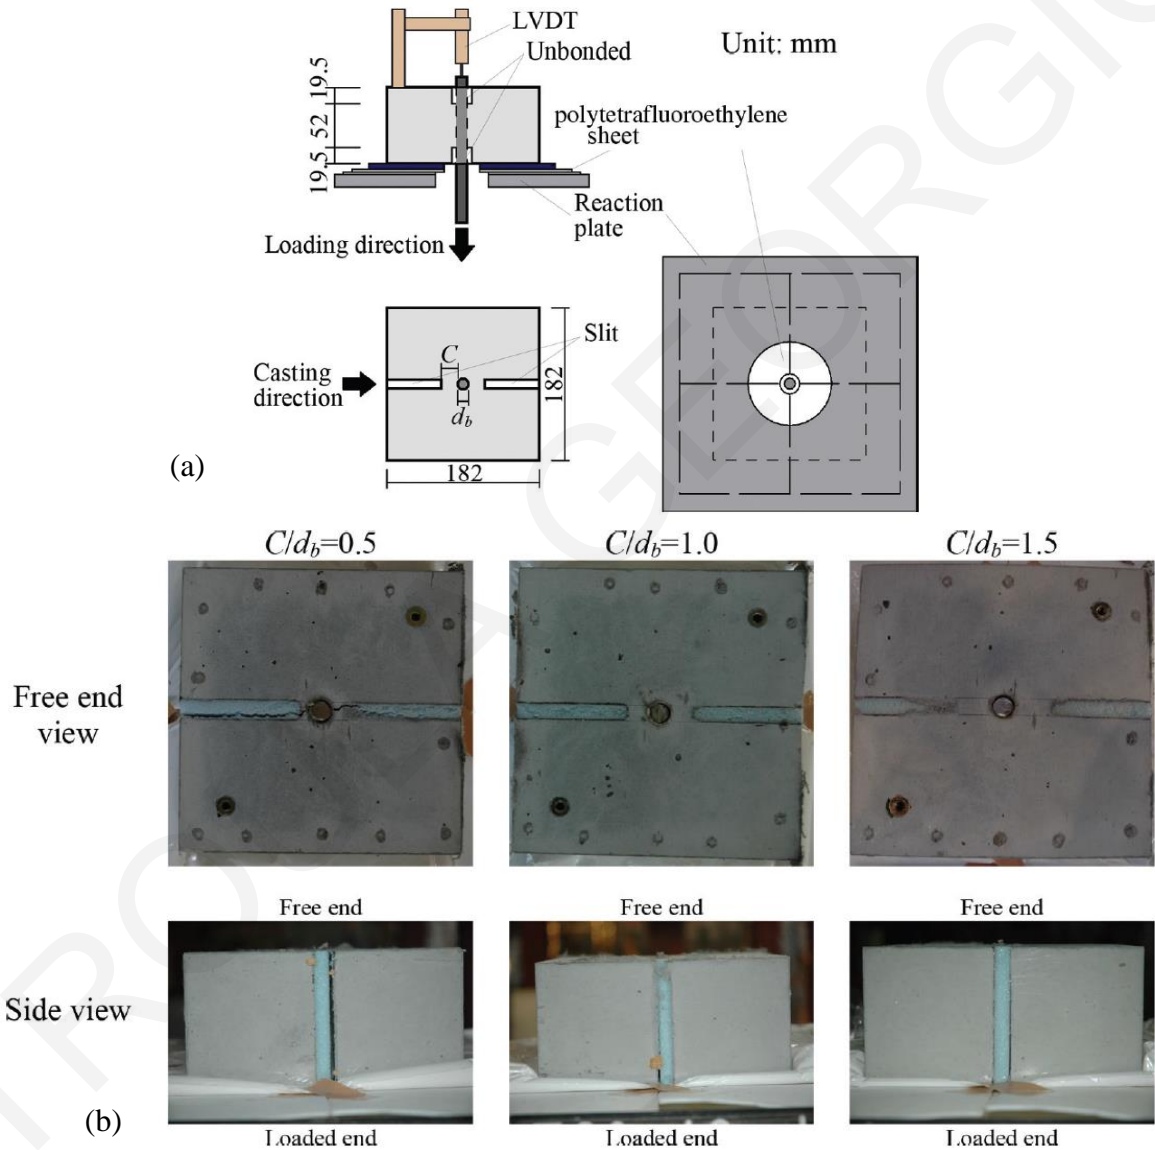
(a) Test setup and (b) pull-out specimens after loading [155]
